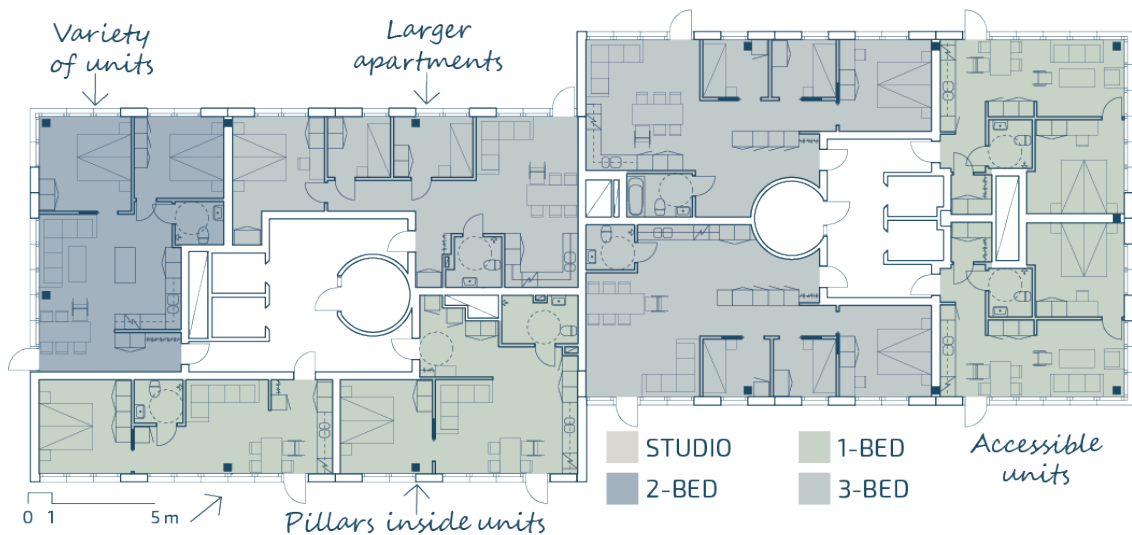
Floor plan for option Swedish standard - large, adapted from Eriksson (2024)
